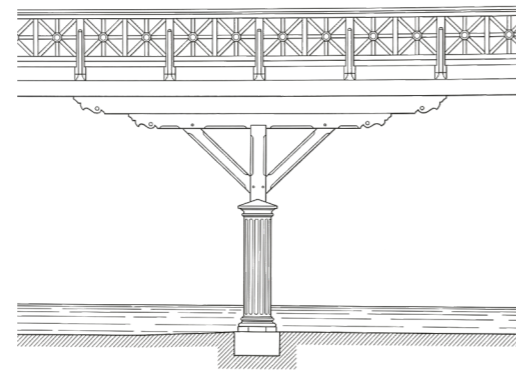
Bridge column with decorative toothed jointing (Henket et al., 1889)
